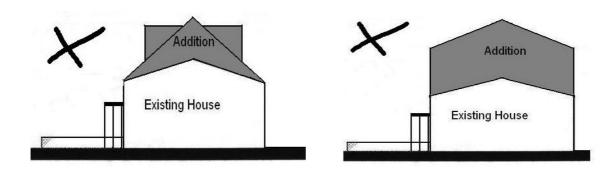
Side view of an unacceptable two-storey addition to a single storey dwelling. These forms change and dominate the roof of the original dwellings.
